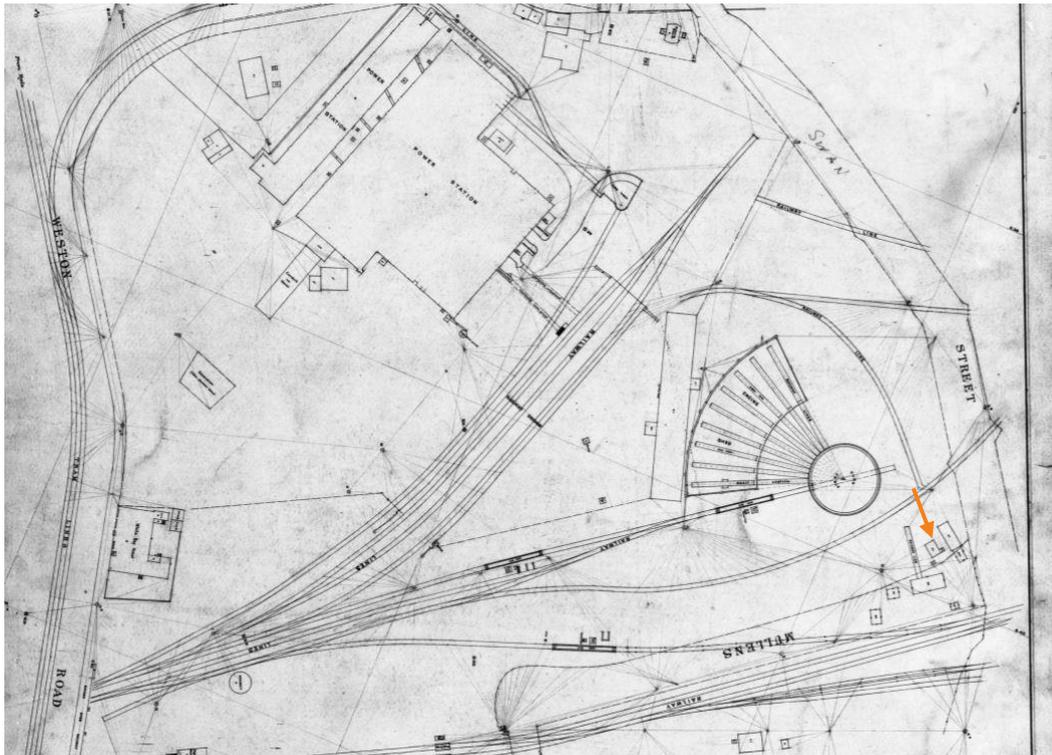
Detail from MBWS & S plan dated April 1920, showing buildings and tracks at the White Bay Power House site as existing by that time. One of the smaller sheds near Swan Street was a transformer house (noted by the arrow). Several buildings nearby were demolished shortly later, when the Swan Street deviation was constructed (noted as Mullens Street on the plan). Source: Sydney Water Archives, DTS 11, MBWS & S, Balmain Sheet 51
